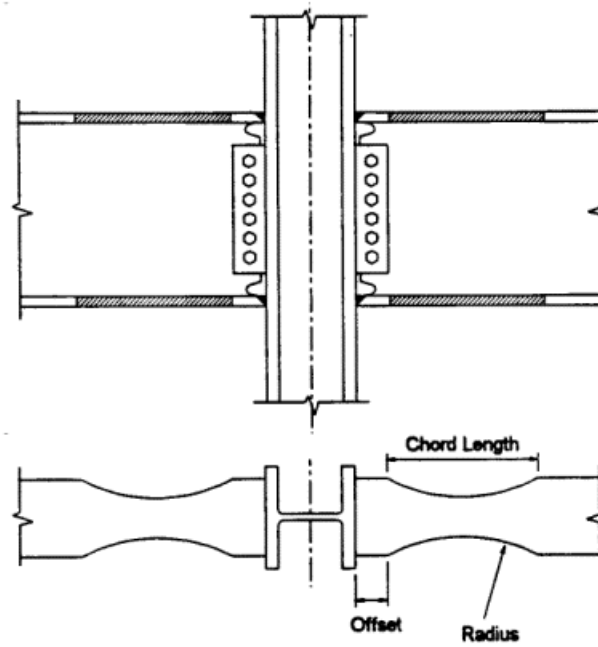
Reduced Beam Section (RBS) Connection
